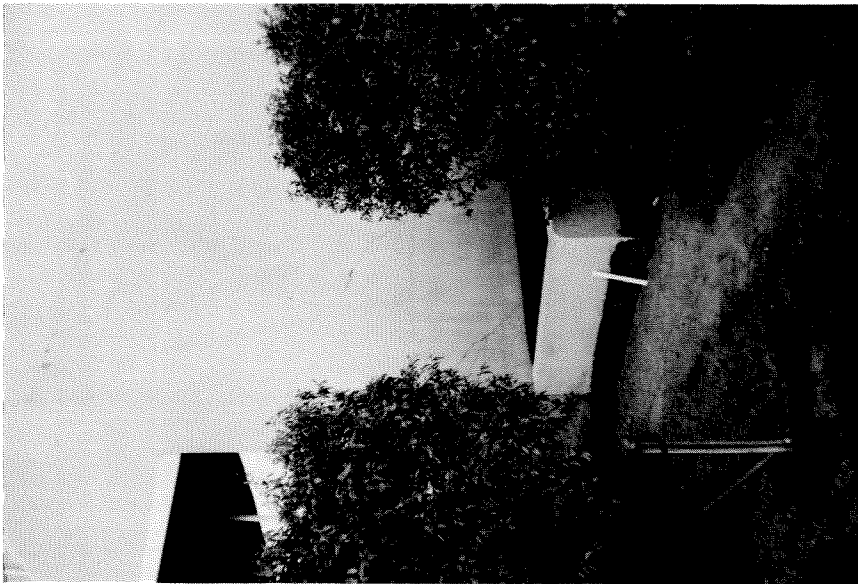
Cracking in west shear wall and settlement of backfill. Three-story wing of the Pacoima Lutheran Hospital.
